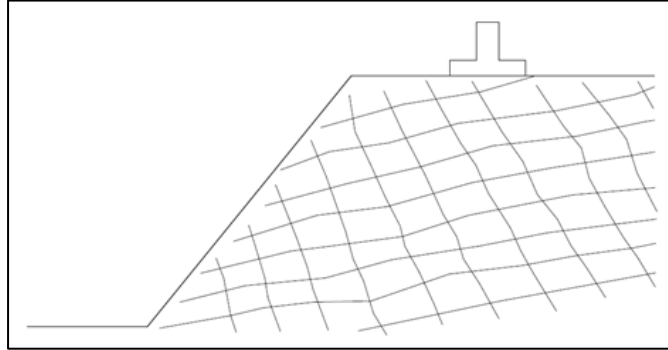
Spread Footing on Rock above a Rock Cut
